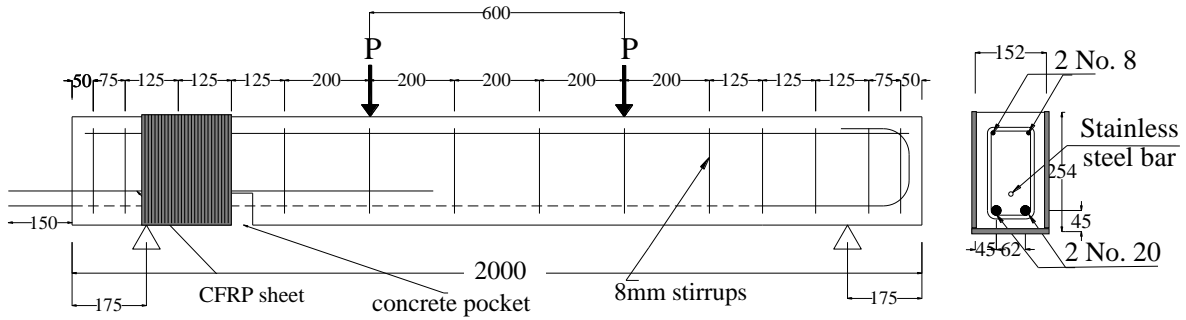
Beam with 200 mm anchorage length wrapped with CFRP sheets.
